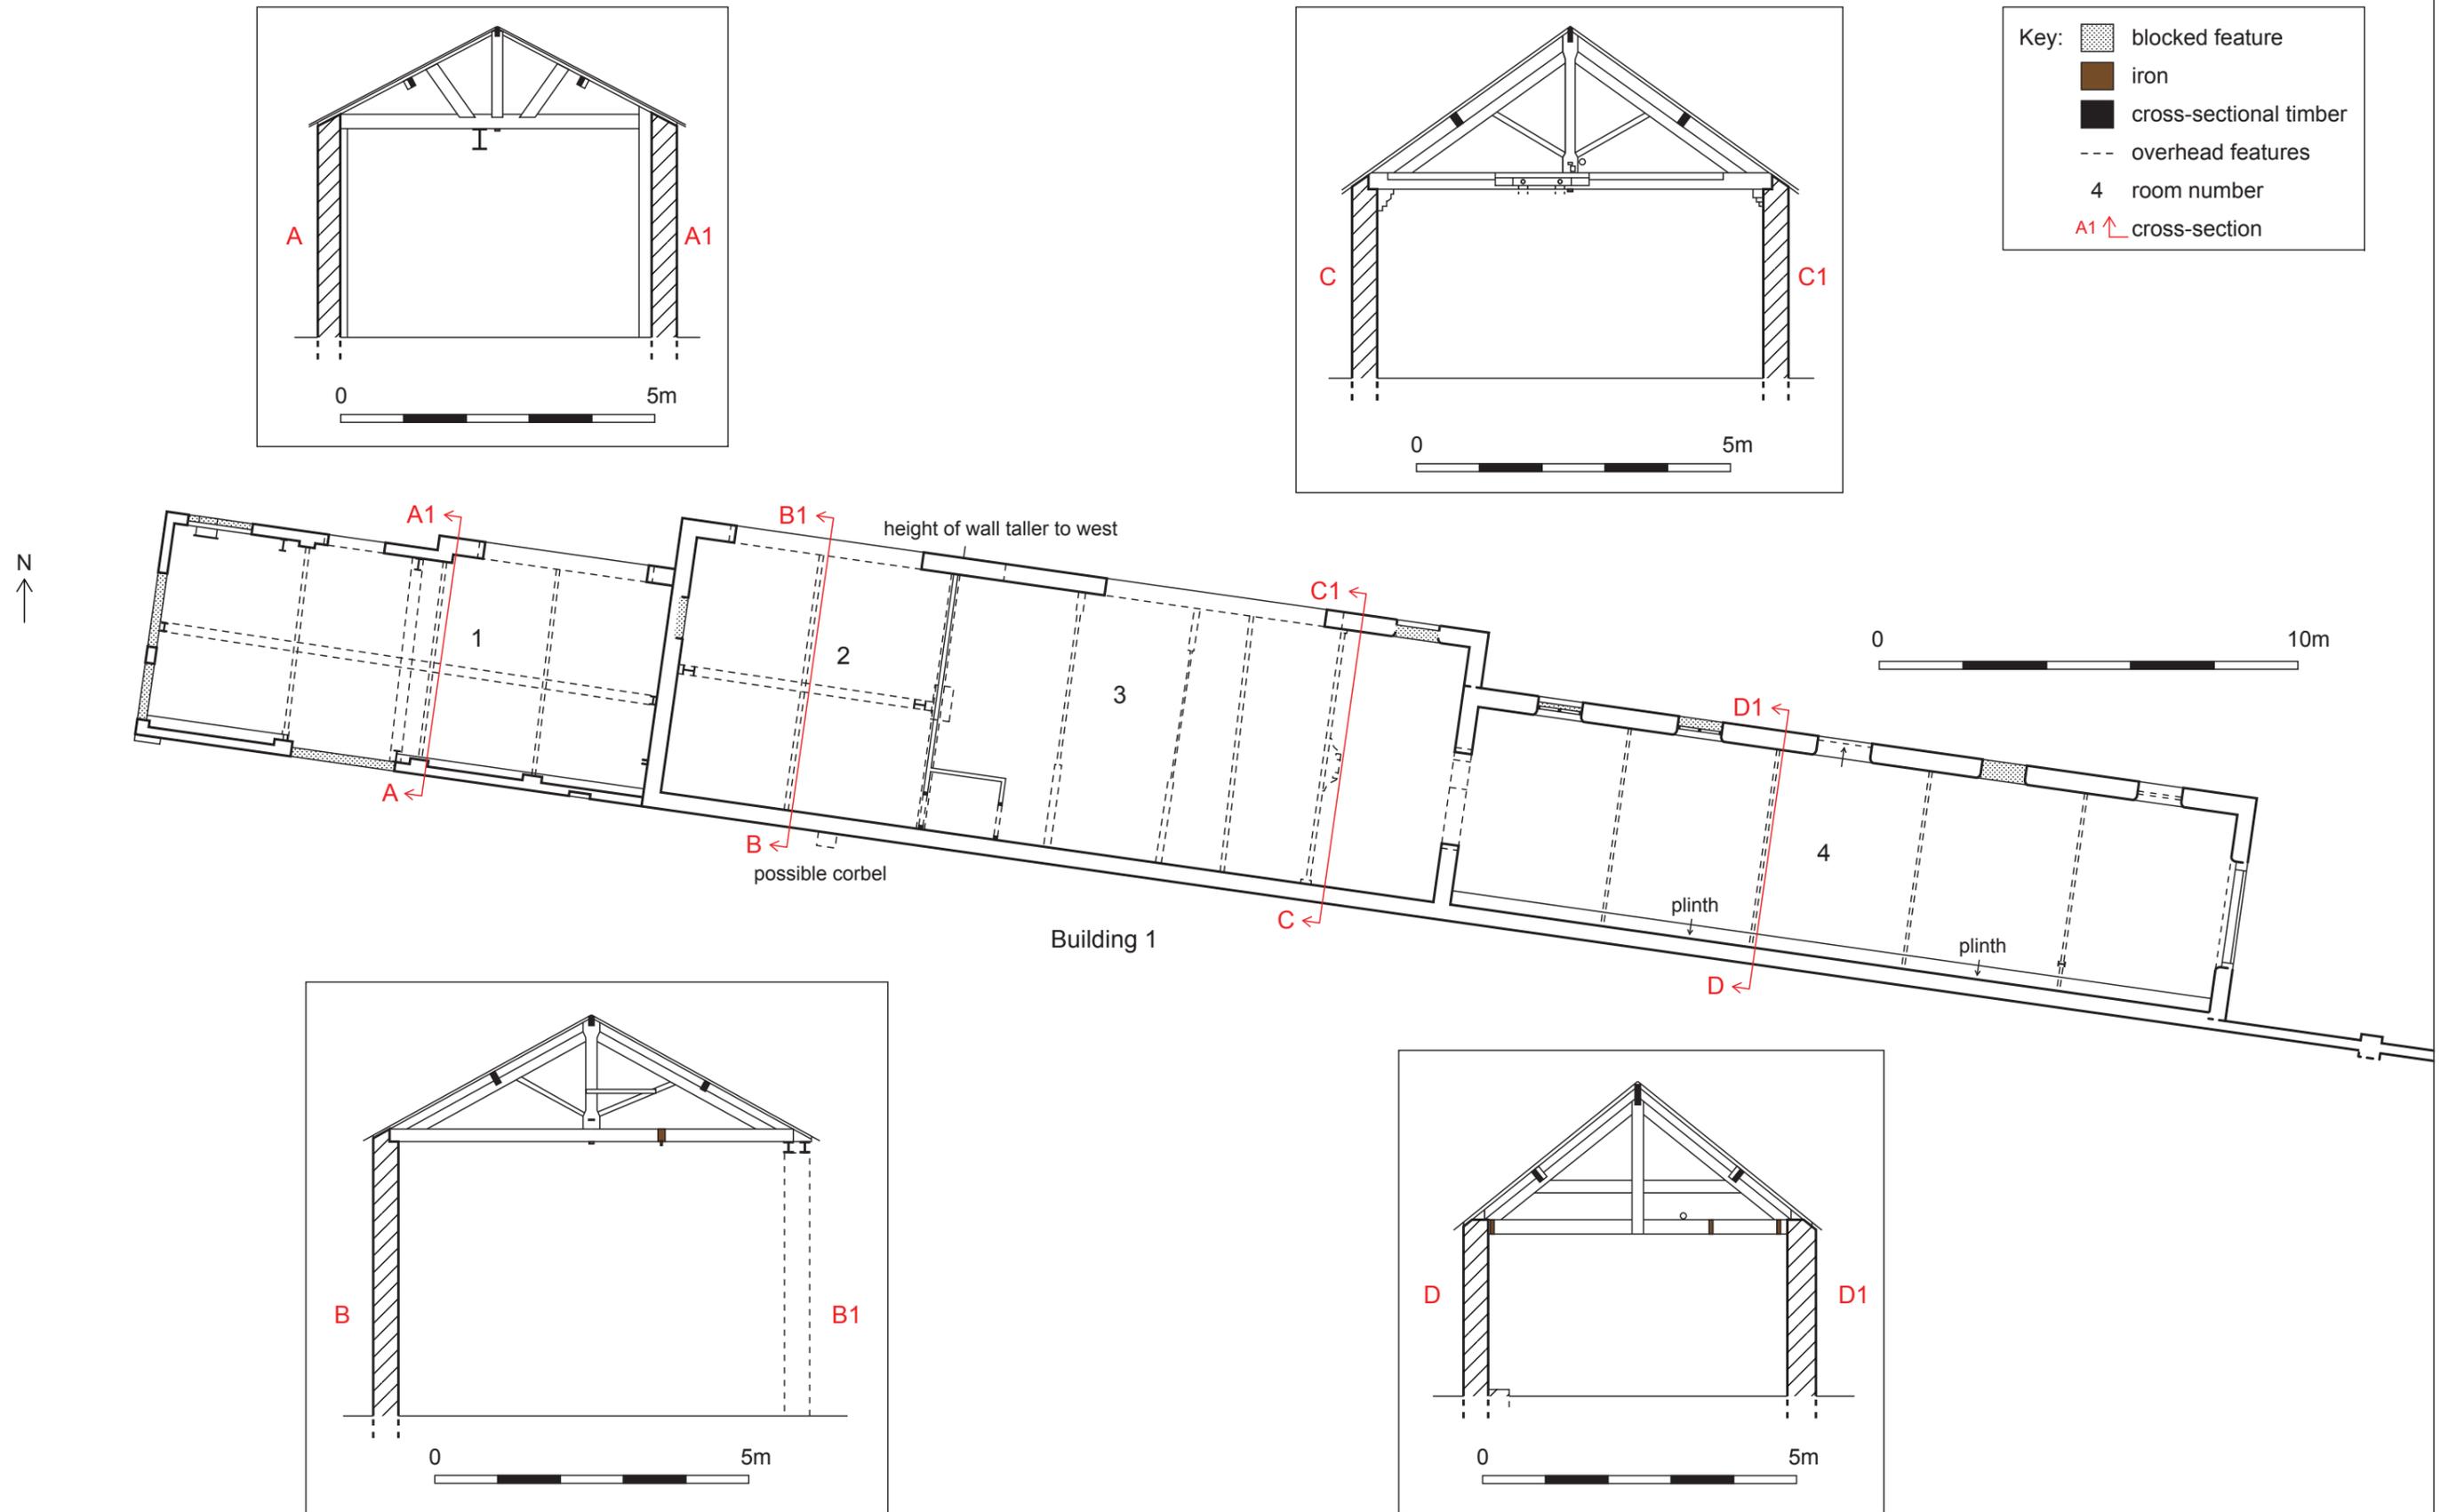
Floor plan of Building 1 and cross-sections A-A1, B-B1, C-C1, and D-D1
